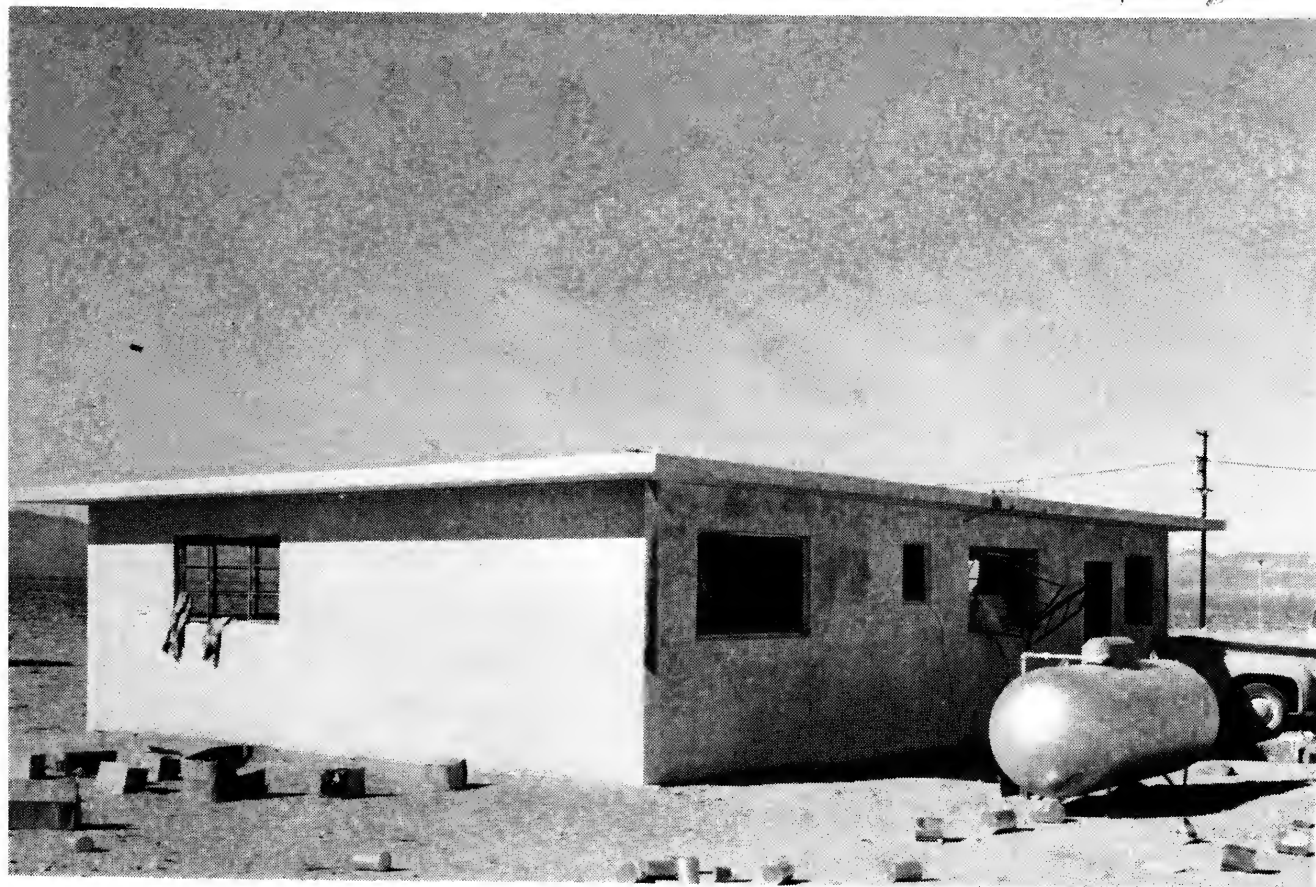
Reinforced precast concrete house after the nuclear explosion (5 psi overpressure). The LP-gas tank, sheltered by the house, is essentially undamaged.
